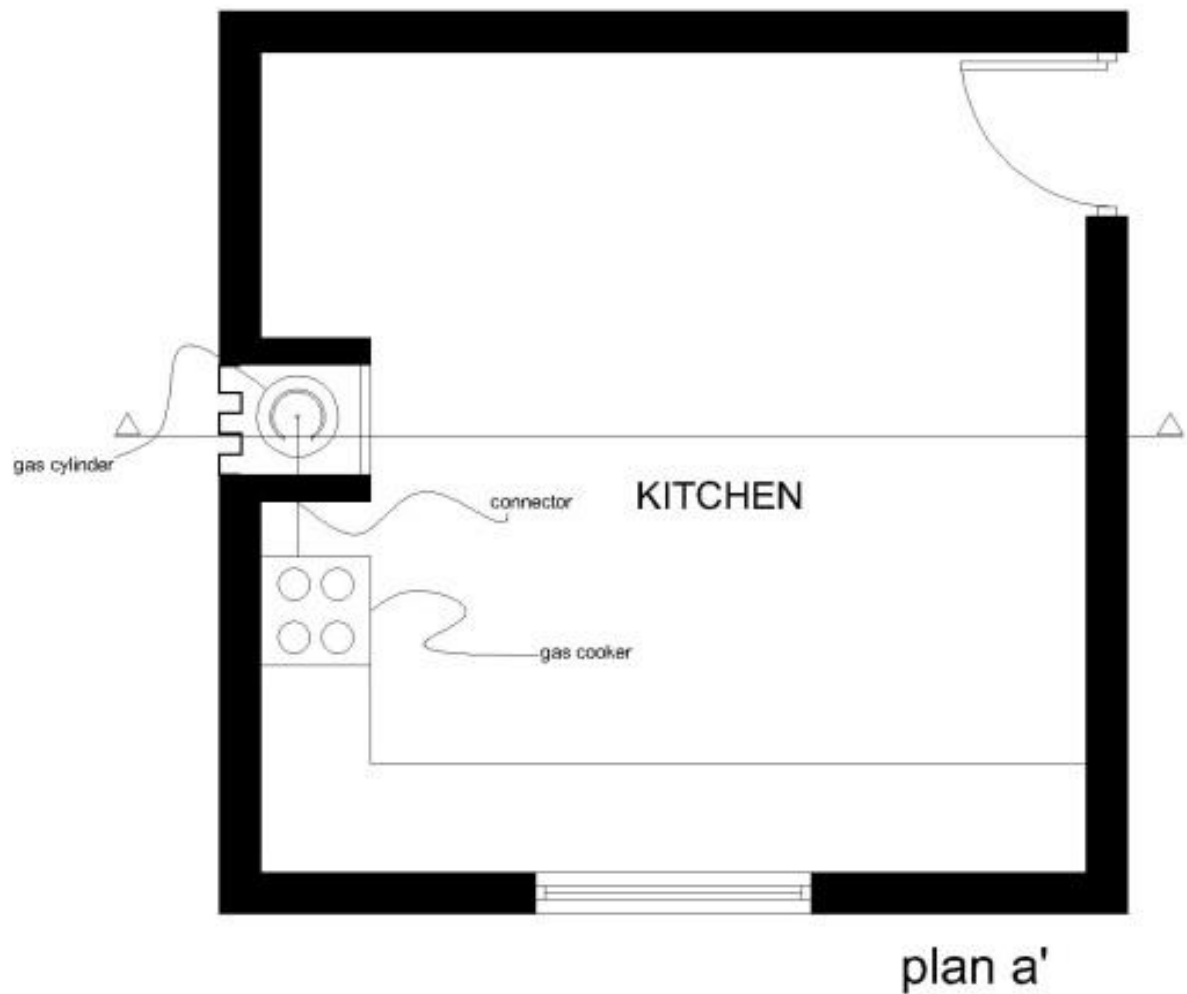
Recommended safe positioning of gas cylinders (floor plan)
